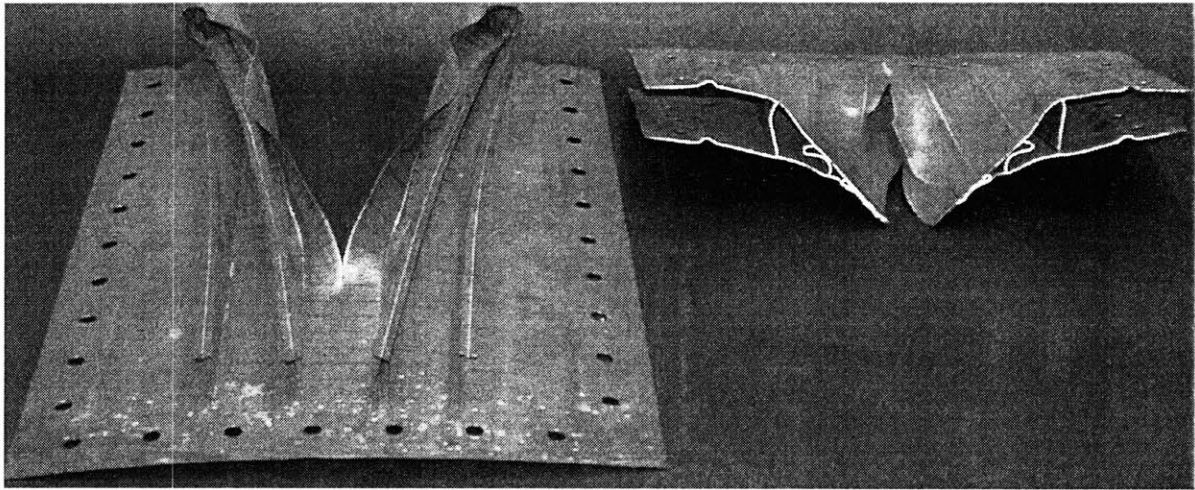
Existing work on damaged and fractured small-scale structural models subjected to localized transverse loading showing the crack propagation between and parallel to the stiffeners of stiffened panels for single (left) and double (right) plate structural configurations
